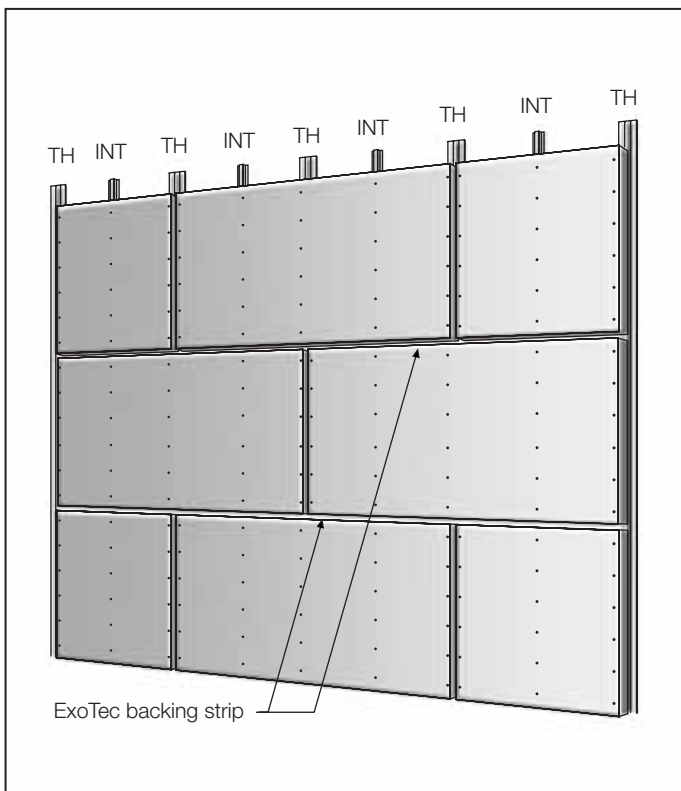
HORIZONTAL LAYOUT BRICK GRID PATTERN
